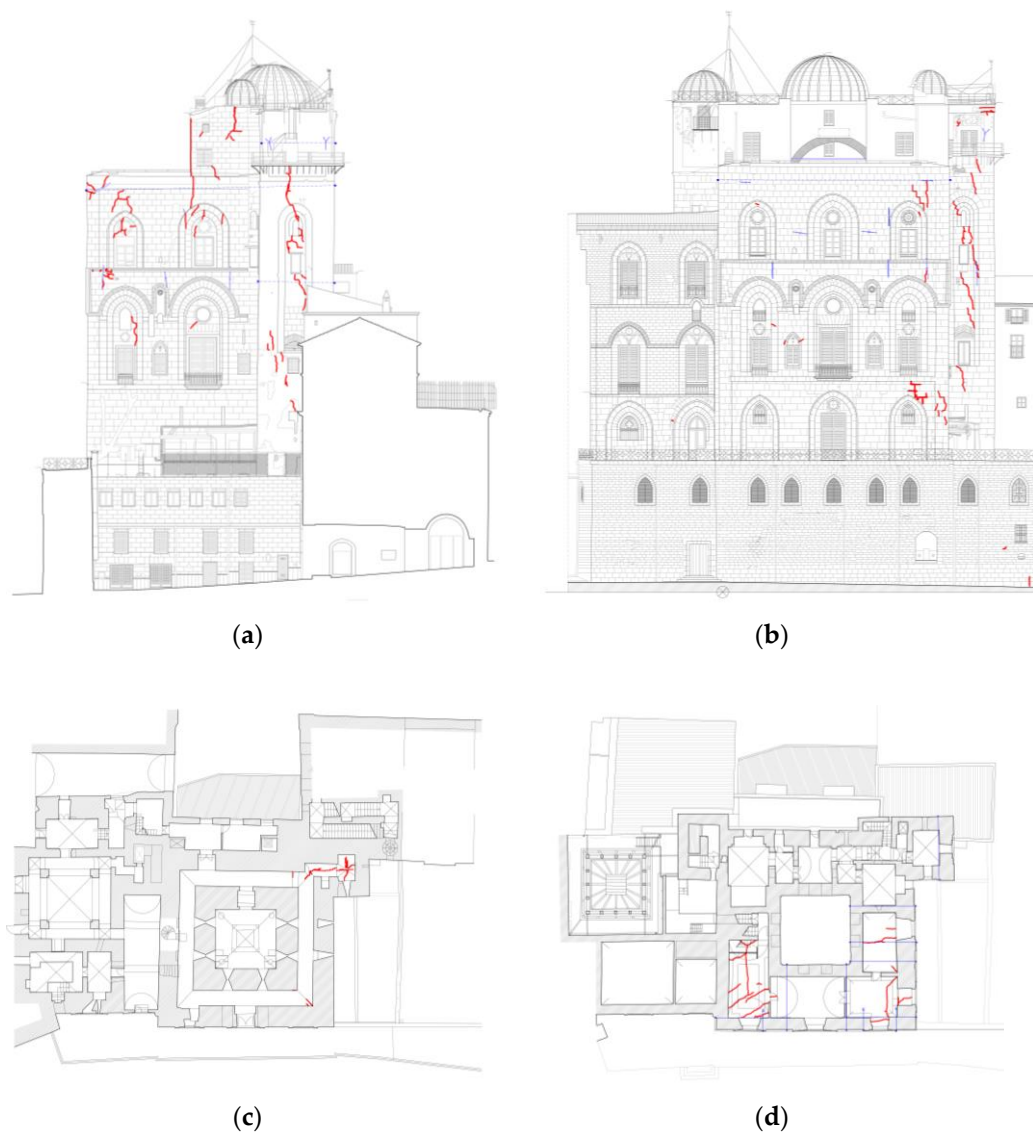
Crack patterns (in red) and steel ties (in blue) (from the drawings of the Officina per le Arti Opera company): (a) on the north side; (b) on the east side; (c) on the floor plan at the height of 13.00 m; (d) on the floor plan at the height of 28.70 m.
